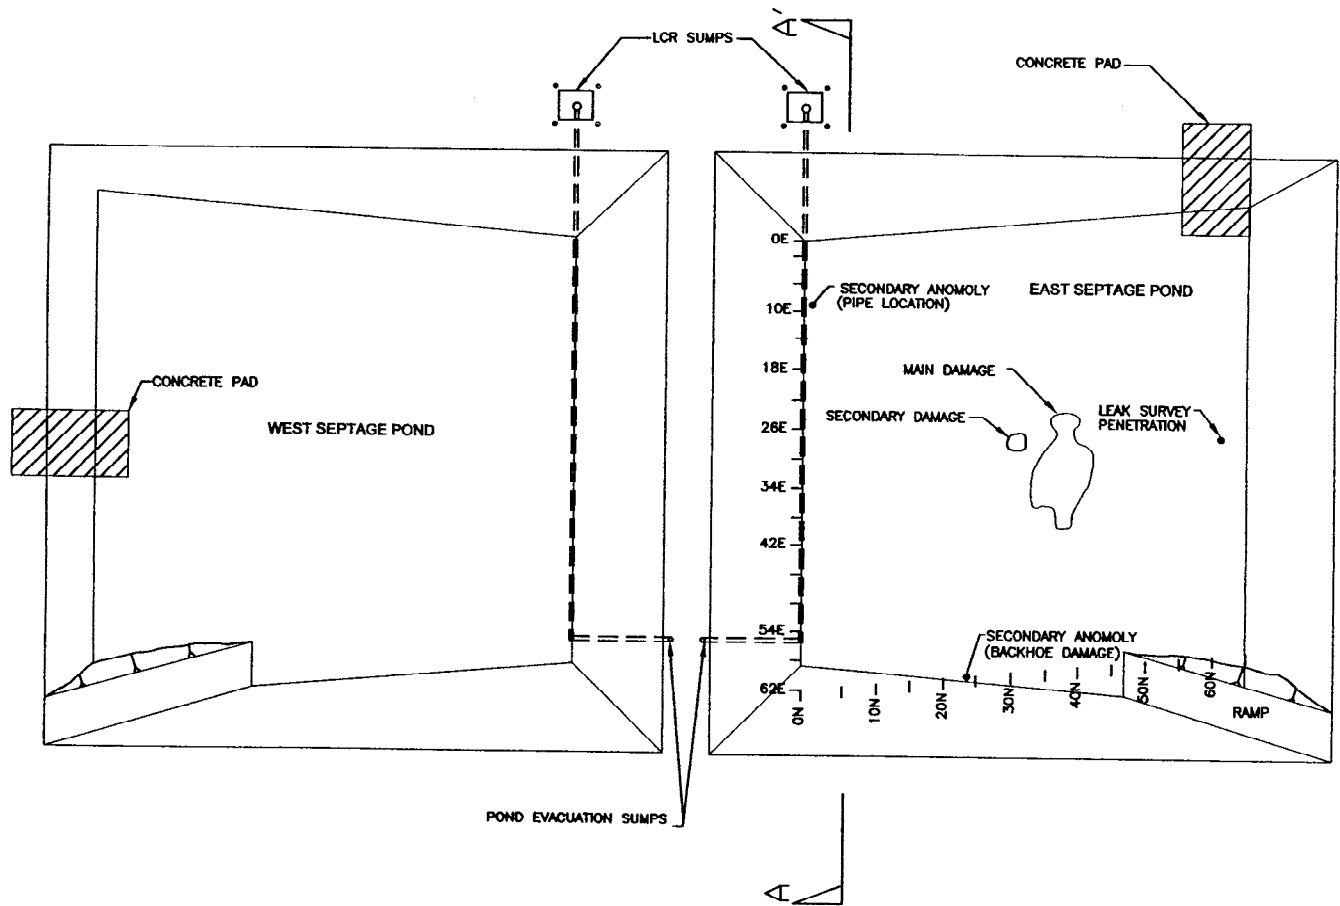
Plan View of Landers Sanitary Landfill Septage Ponds
